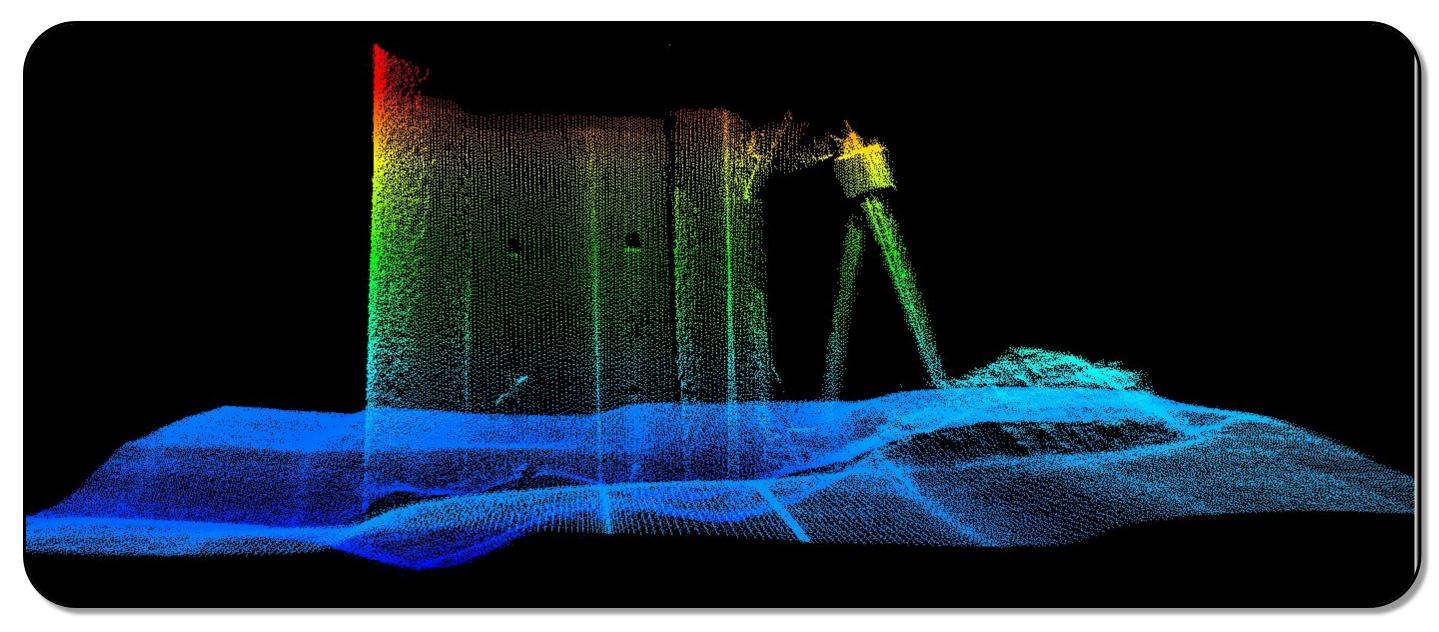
Example point cloud image of Pier 10 from the south. Visible in the image is the undulating river bottom elevation surrounding the bridge pier, the concrete bridge pier, and angled piles and a pile cap to the right side of the image.
